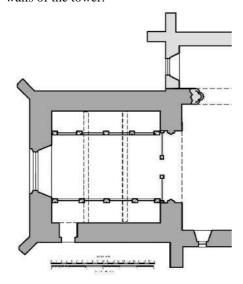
A plan of Cradley Church tower showing the layout of the two timber frames
